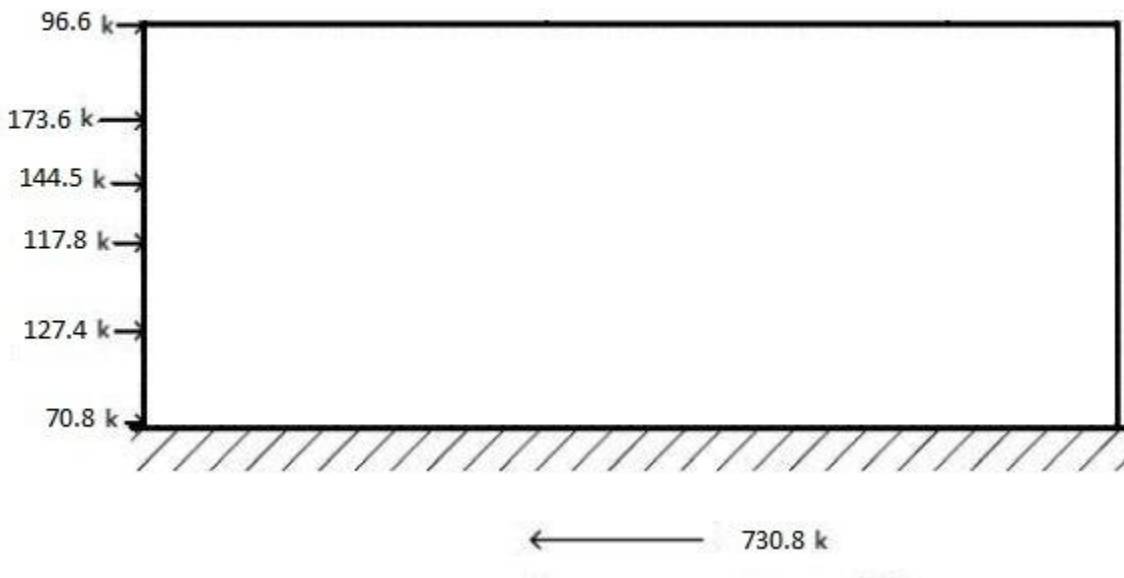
Wind Forces acting at each floor level on the West Wing, East and West facades
